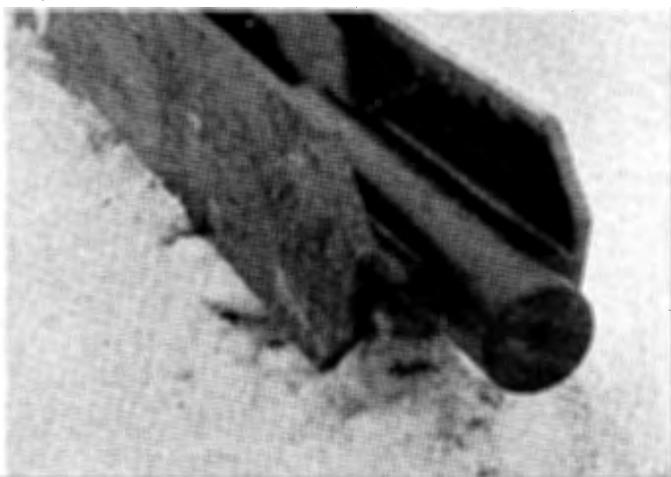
PHOTOGRAPH OF PILE POINT FOR H-SECTION.
